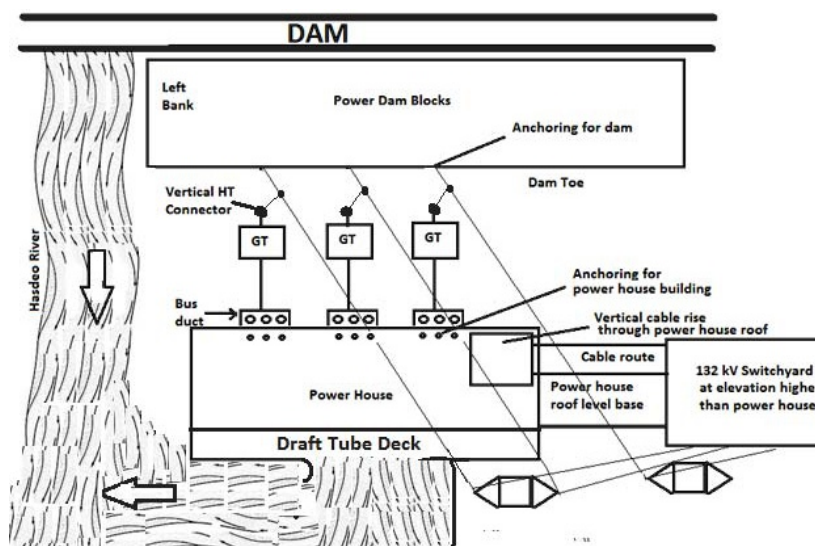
Relative positions of power house building, G.T., and Switch yard of Hasdeo Bango HPP
